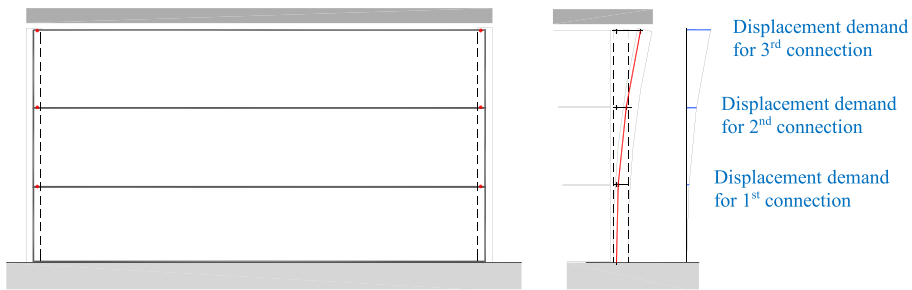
Horizontal displacement demand for the (h2) connections supporting horizontal cladding panels positioned at different heights above the ground
